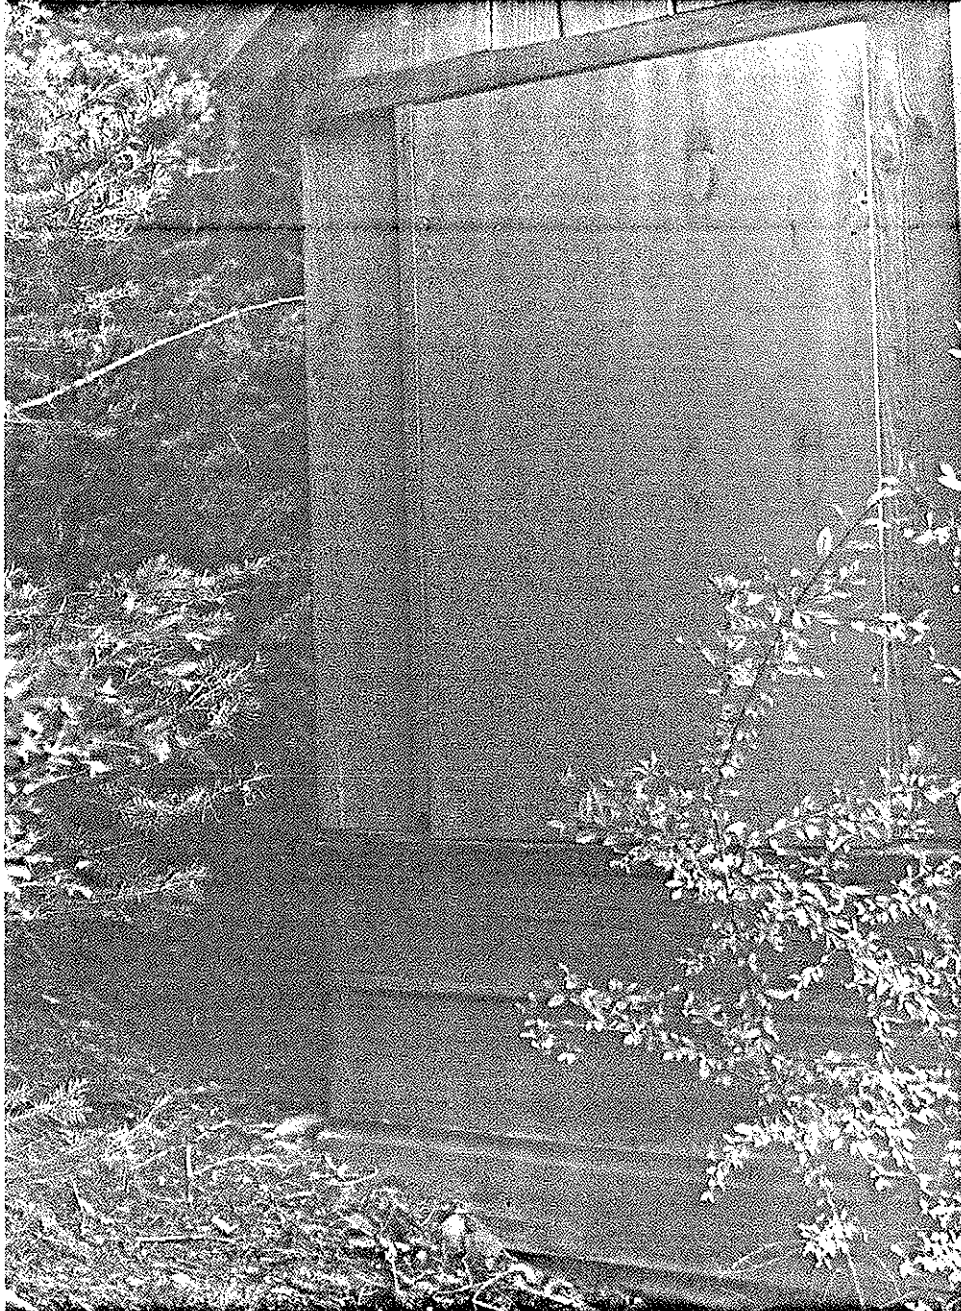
Santiam Lodge. Northwest corner of the back wing of the structure. View shows back hillside settling into building along north elevation. October 1988.
